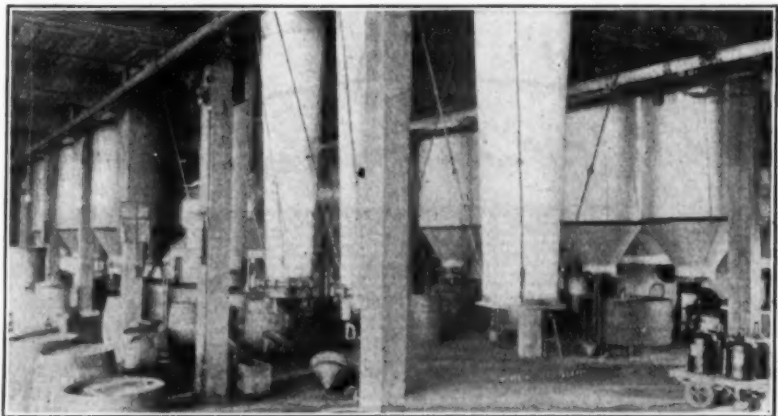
General Interior View of Fine Installation of Sheet Metal Piping in Plant of Upjohn Plant—Work Done by Kalamazoo Sheet Metal and Manufacturing Company.
